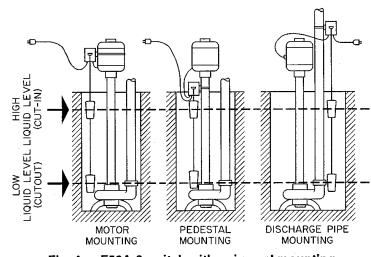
F59A-2 switch with universal mounting mounted on motor, pedestal or discharge pipe.
